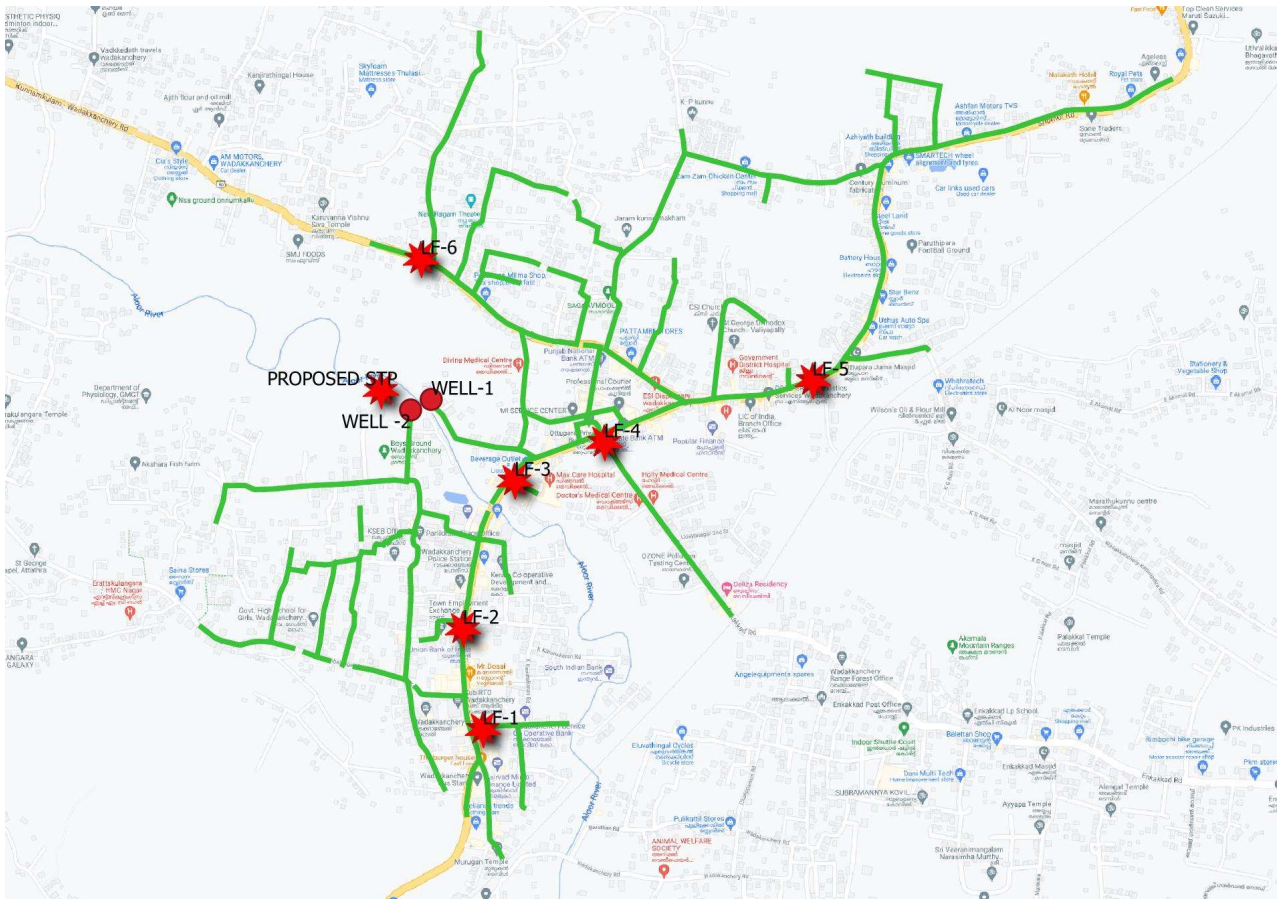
Sewerage zones with lifting station, collection wells and proposed STP
